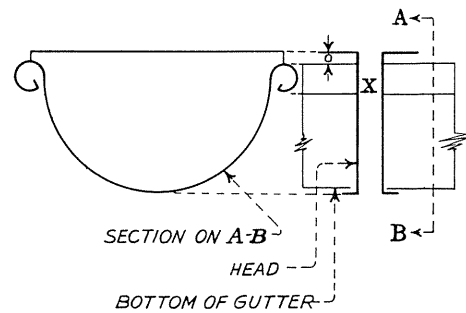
METHOD OF CONSTRUCTING EXPANSION JOINT IN EAVE TROUGH
